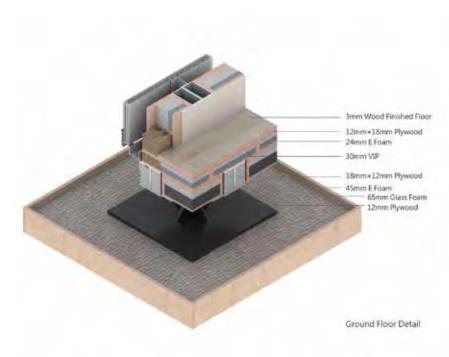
Adjustable Footing in Versailles Site
